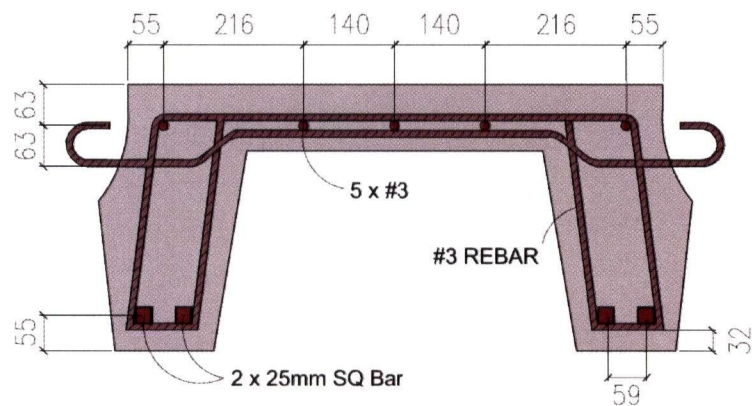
Reinforcement Details and Dimensions of Channel Beam Cross Section
